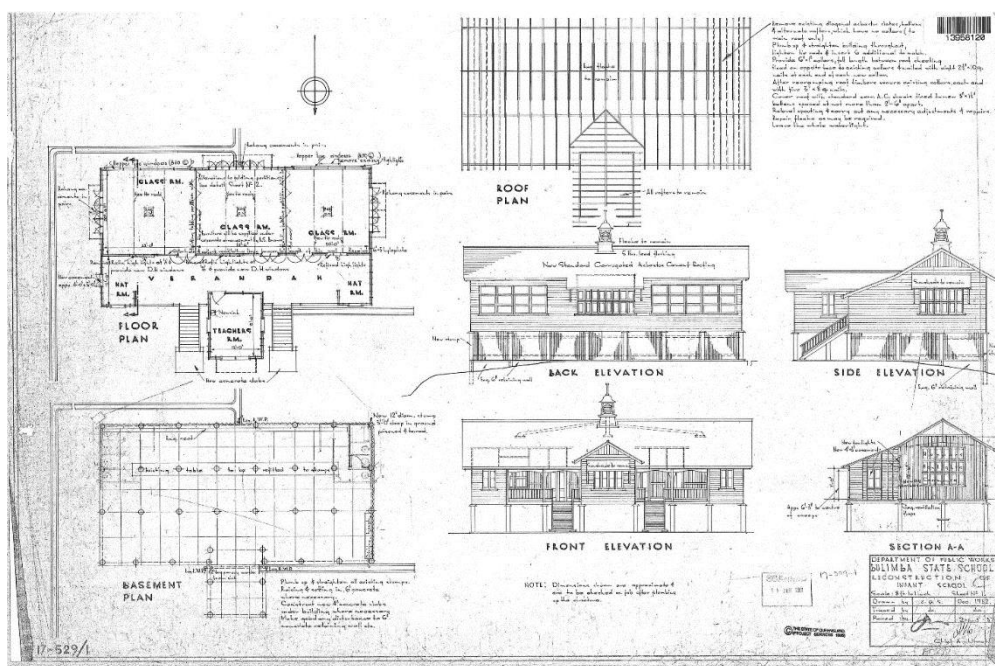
Reconstruction of Block C 1952 (eplan 13958120). The new hopper windows are visible in the rear elevation.
